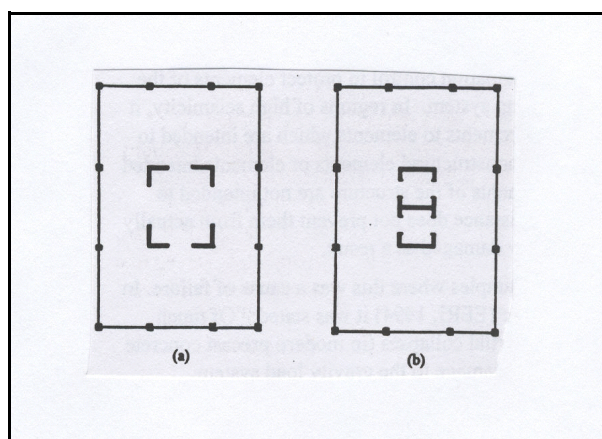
Arrangement of shear walls and braced frames – not recommended. Note that the heavy lines indicate shear walls and/or braced frames.
